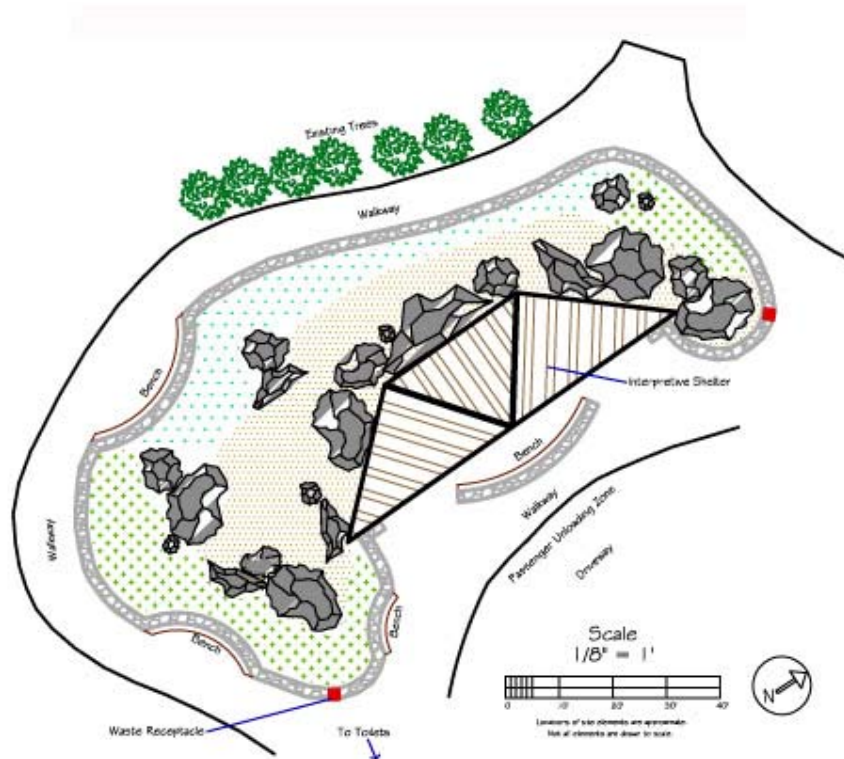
Site detail plan for proposed Diablo Lake Overlook rehabilitation design
